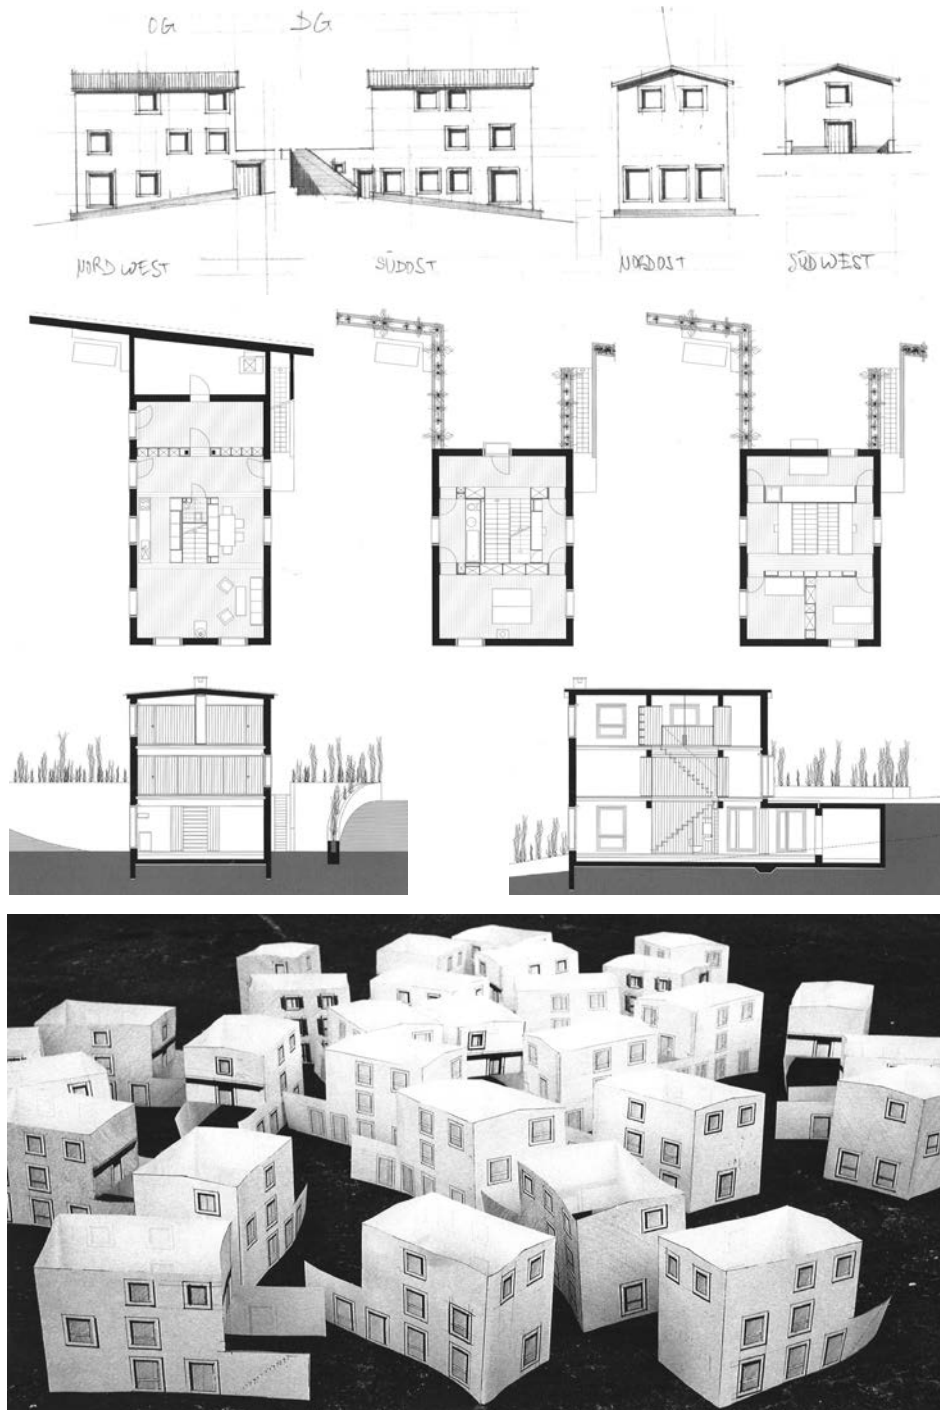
Raselli House in Poschiavo, Grisons, 2001-2002. Sketches, layout plans, cross and longitudinal sections, maquette
